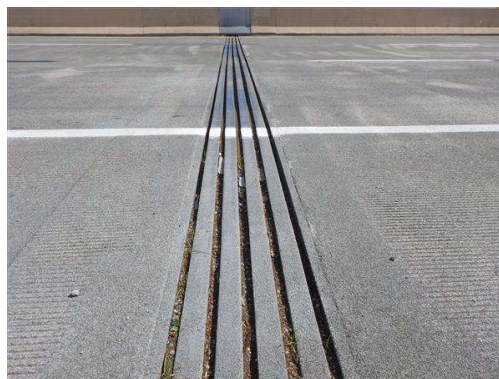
Expansion joint at Pier 30SB filled with debris and growing vegetation looking East
